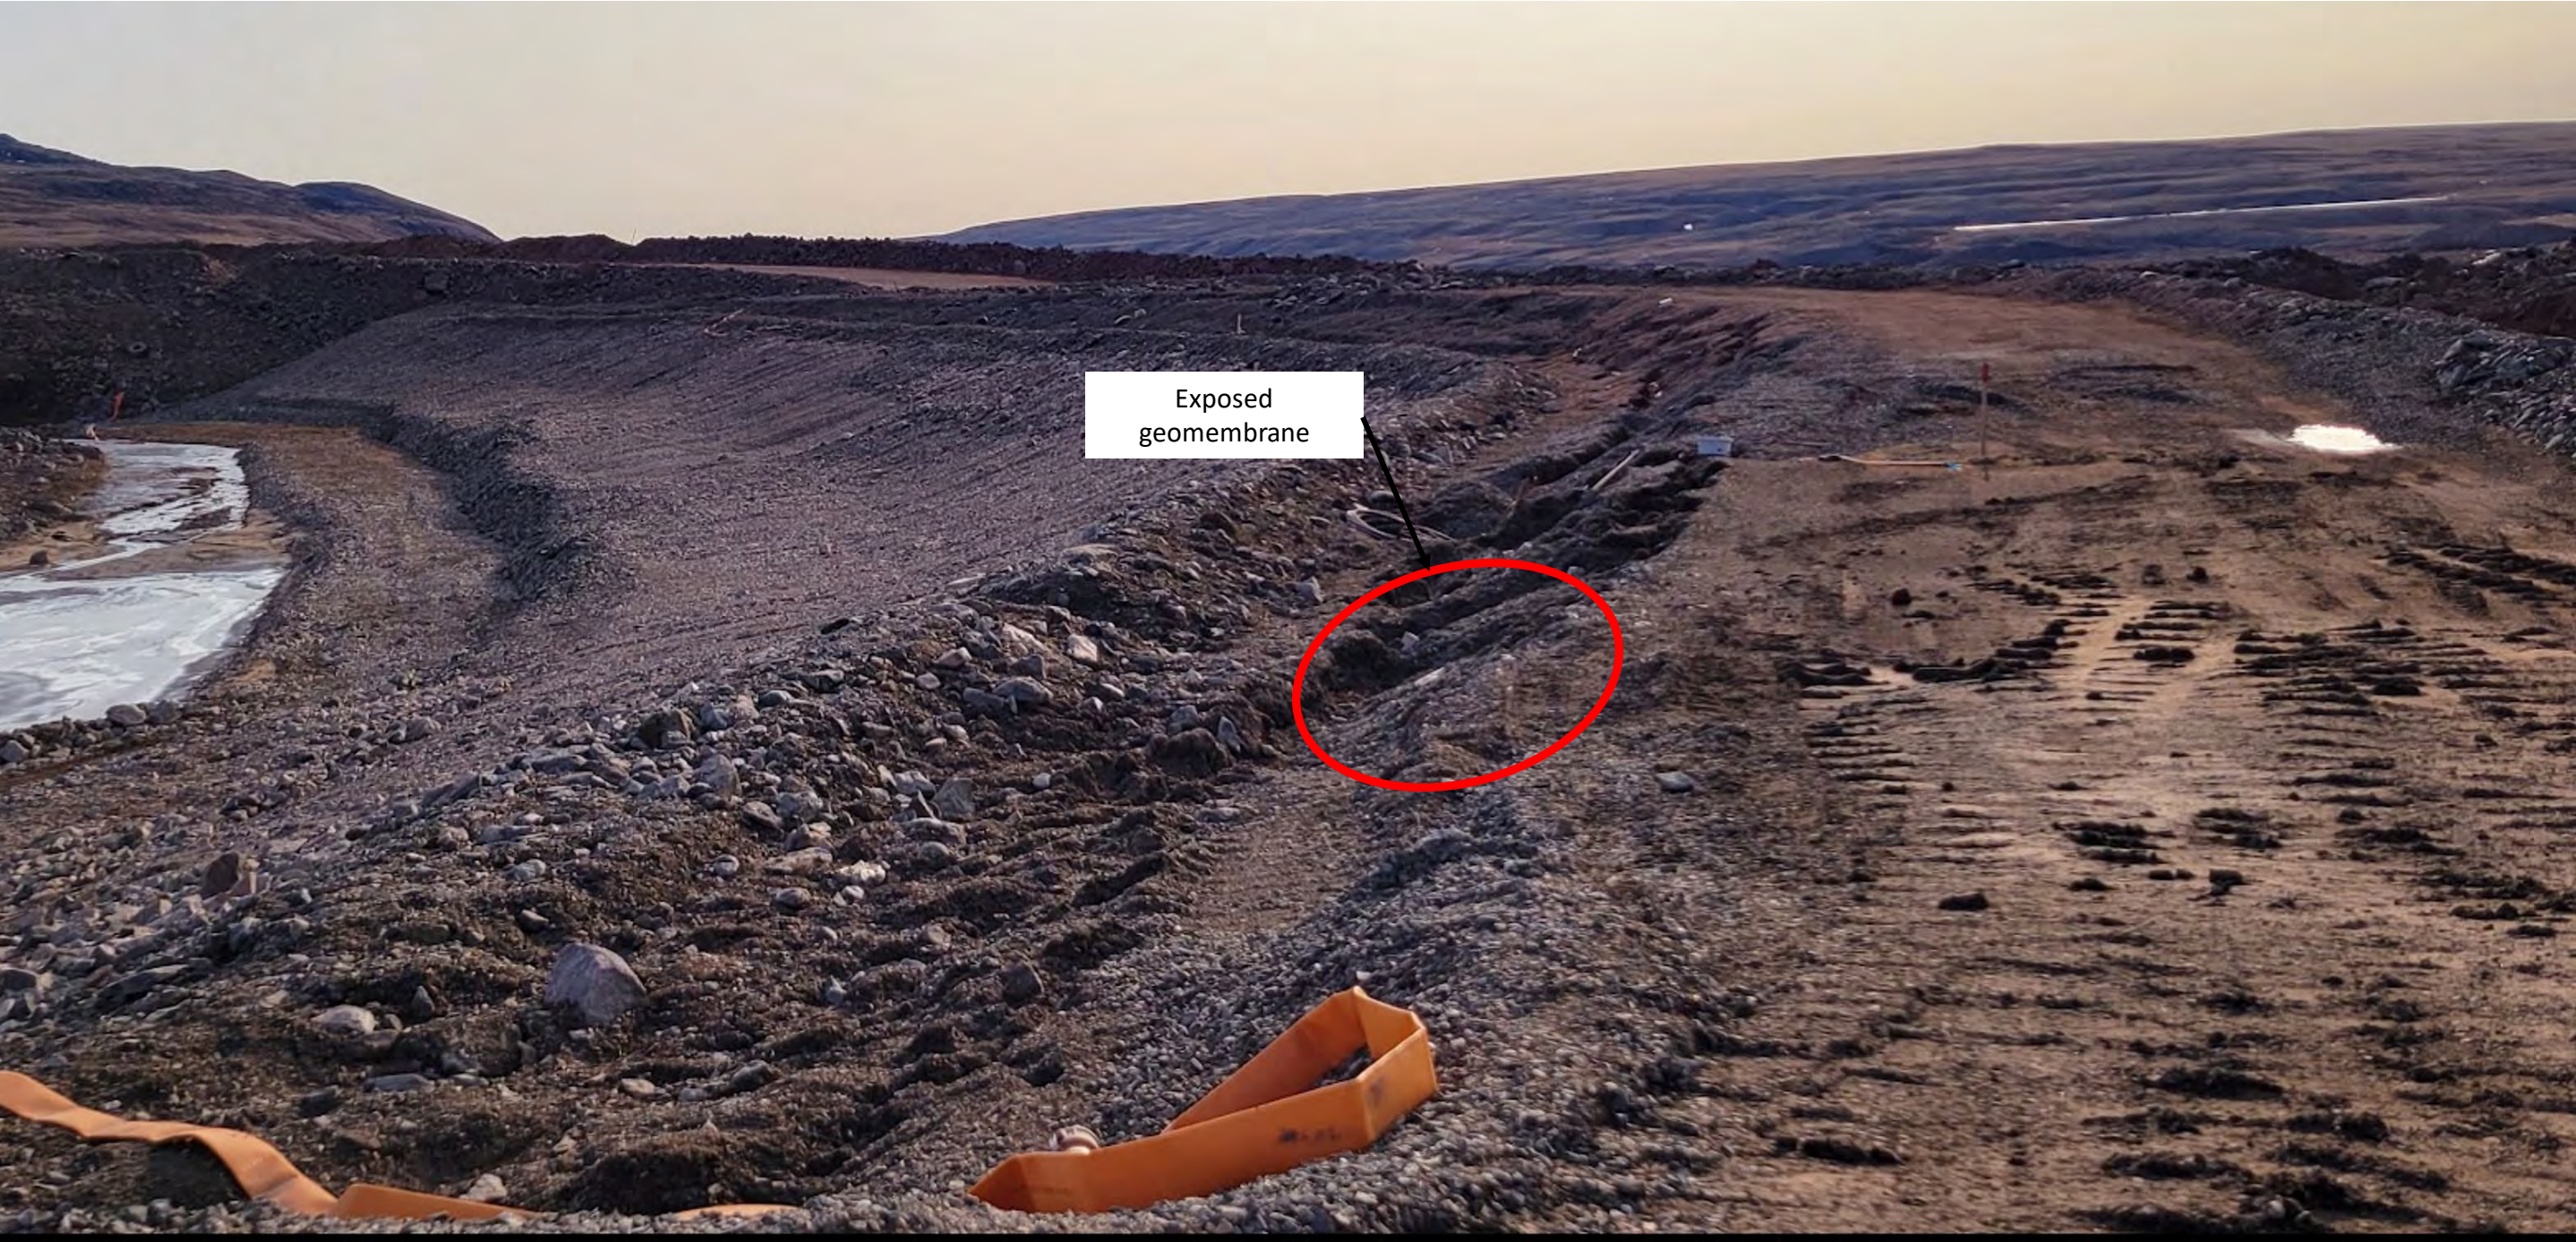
View of damaged crest and upper portion of the upstream slope of the KM 105 South Embankment. The damage to the uppermost surface the downstream slope continues to progress.
